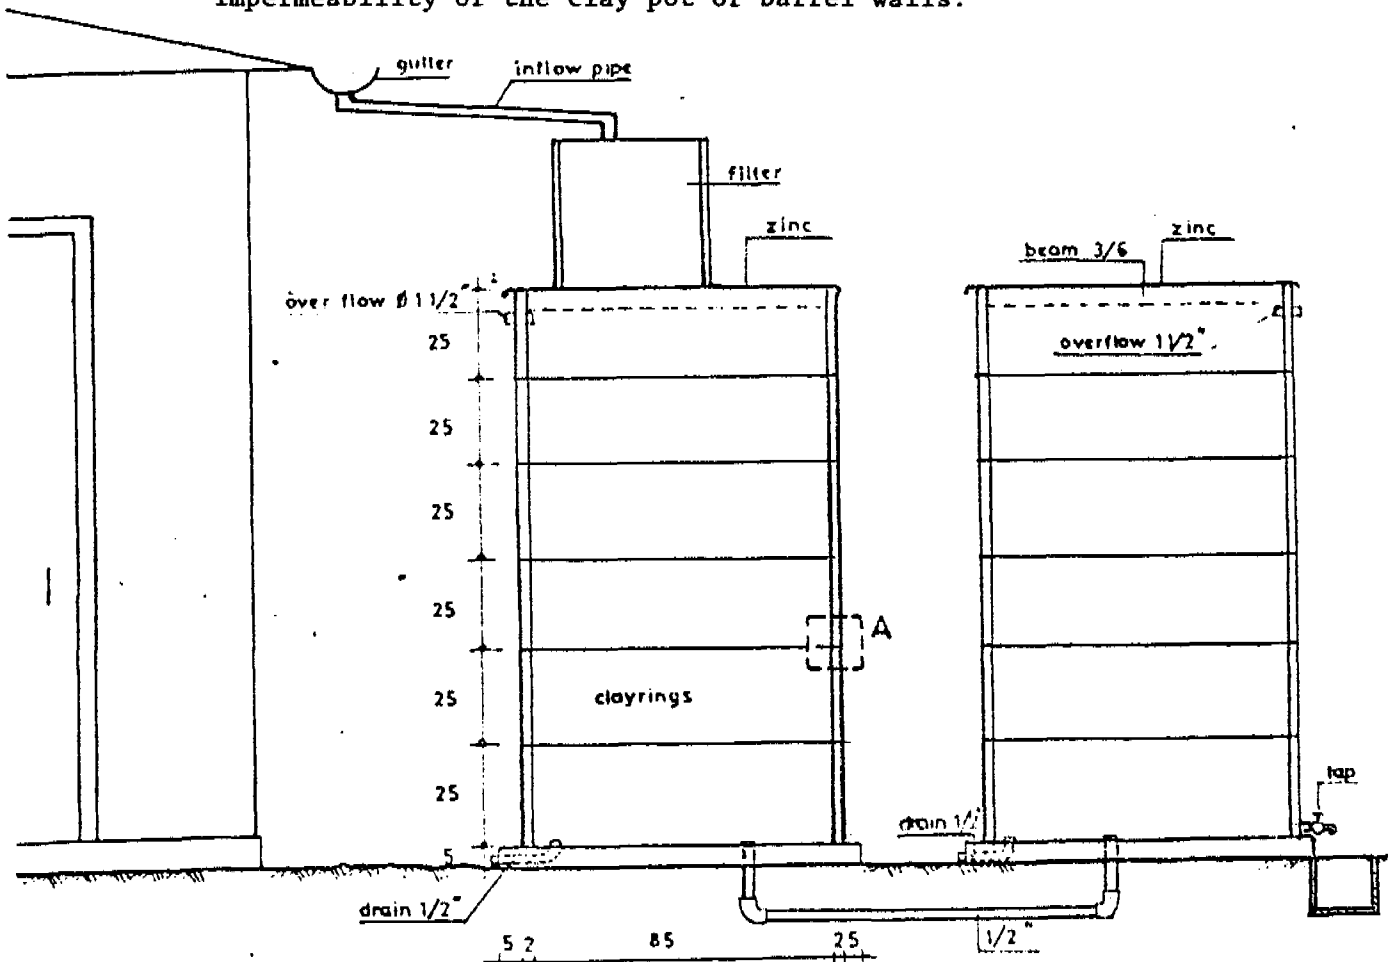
Storage Tanks built of Clay Rings (850 litres)
